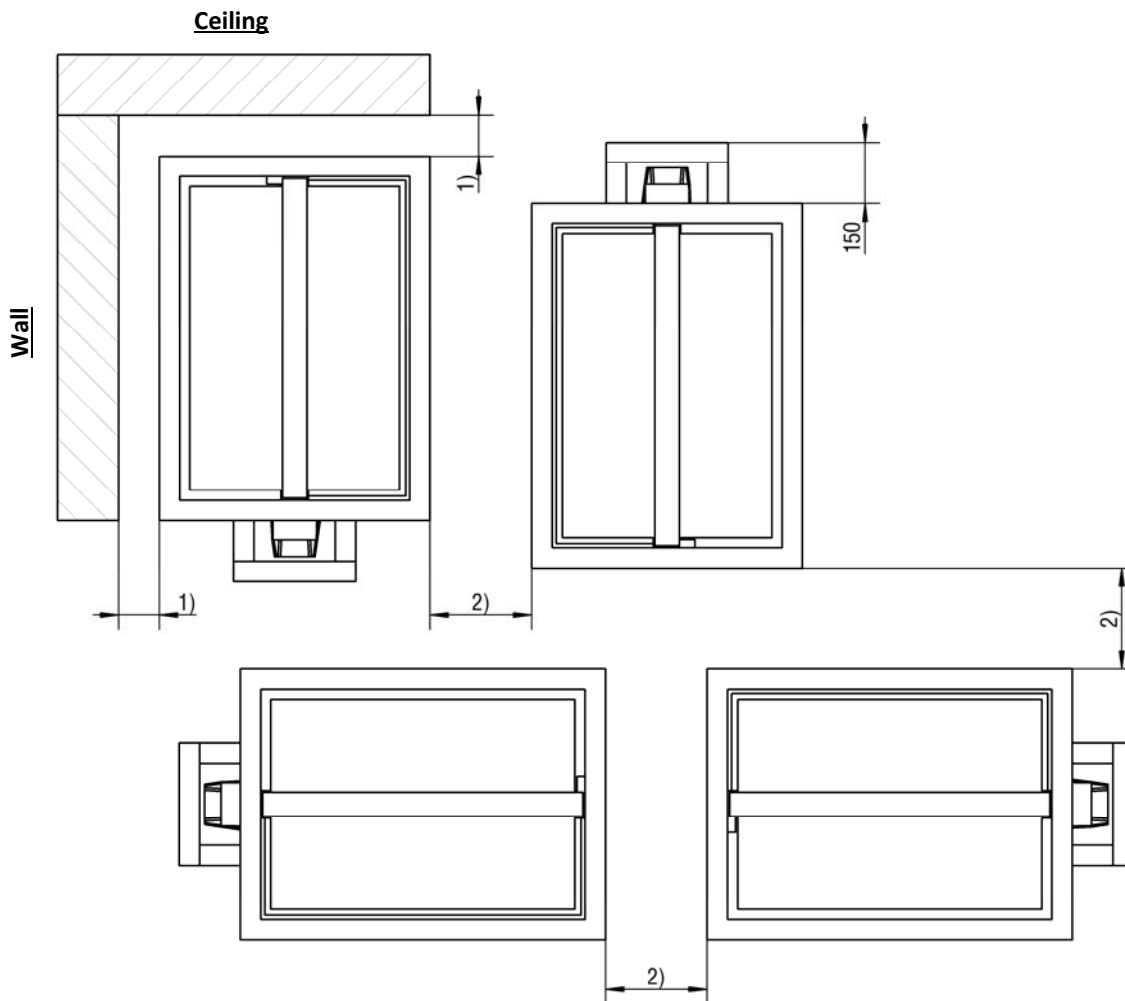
Minimum distances to walls and ceilings and ERK-SO to one another
